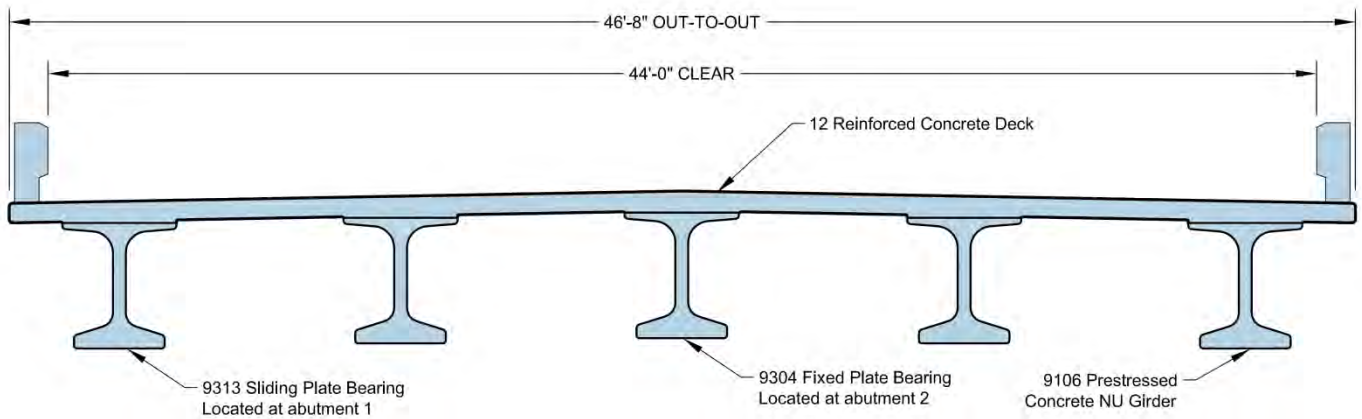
EI.24.5- 2: Plan view of simple prestressed concrete beam bridge
